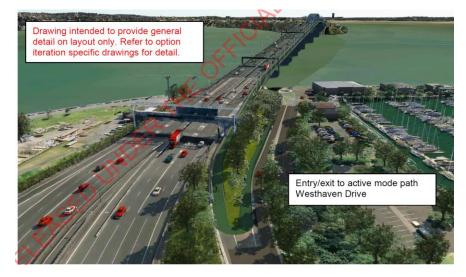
Westhaven Drive Access/ Egress. Local road realigned / repurposed Shelly Beach Rd off ramp may need to be closed.
